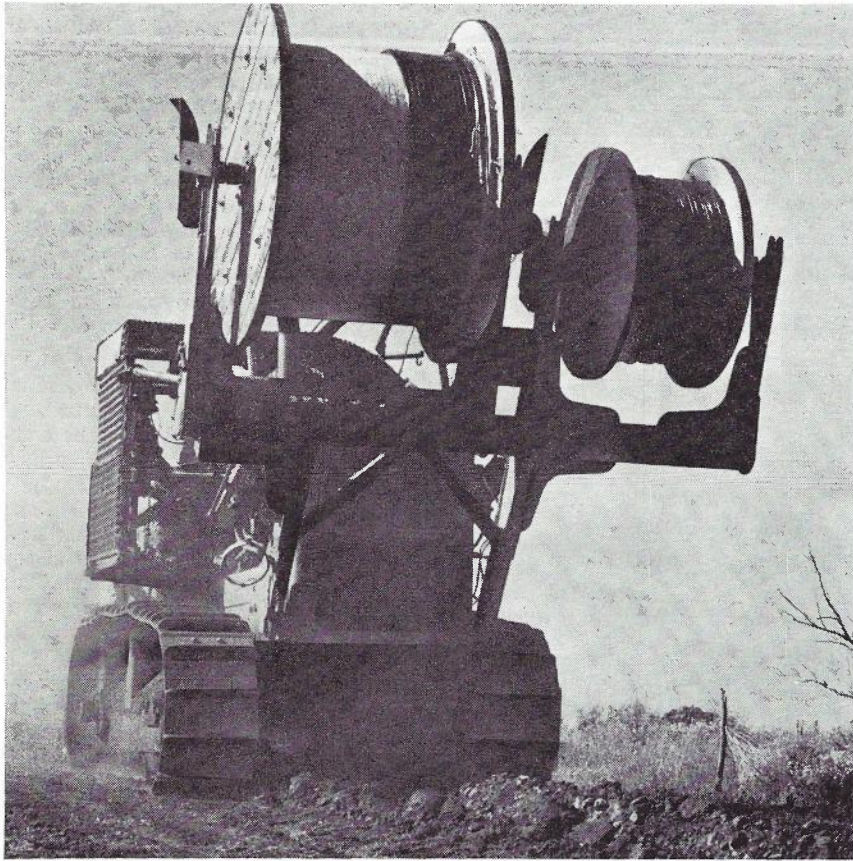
A Front View of the Cable Layer Illustrating the Drum Carriage Arrangement.
